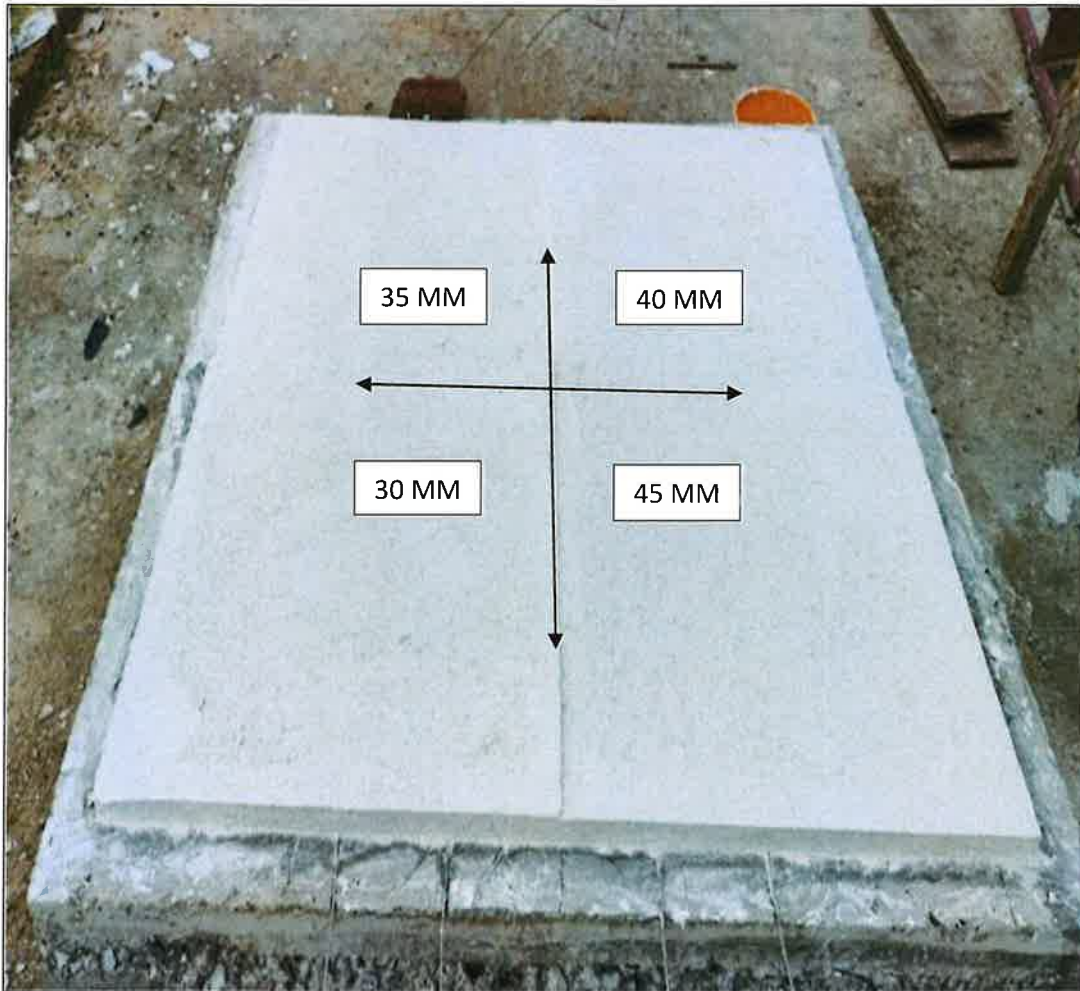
Construction details of Concrete slab protected with insulating material U Stucco-FRX
